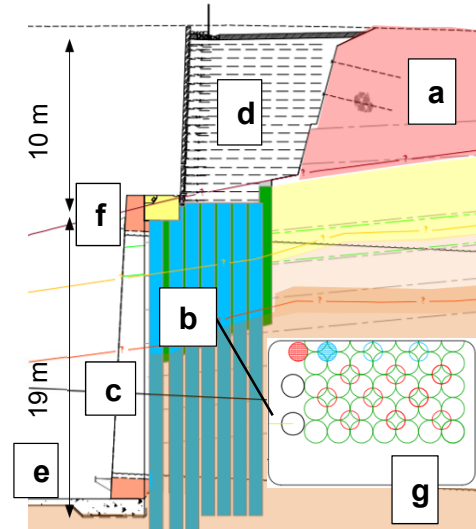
Section through portal headwall showing features in order of construction sequence. a) Basalt excavation and temporary bolting, b) Weak concrete piled block c) Excavation to maximum depth in front of piled block undertaken concurrently with d) MSE Wall, e) sump base slab and, f) RC headwall. g) Plan layout of the interlocking weak concrete piled block.
